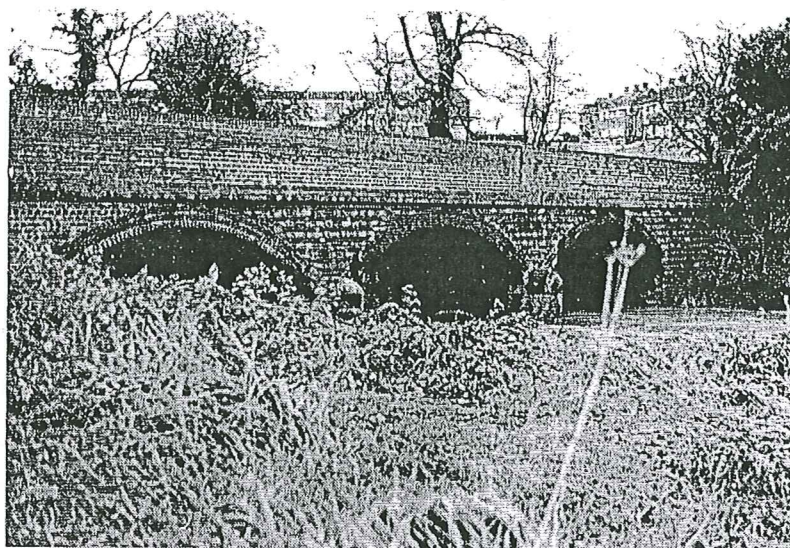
LEA CRESCENT BRIDGE AND BRET福德 BRIDGE
